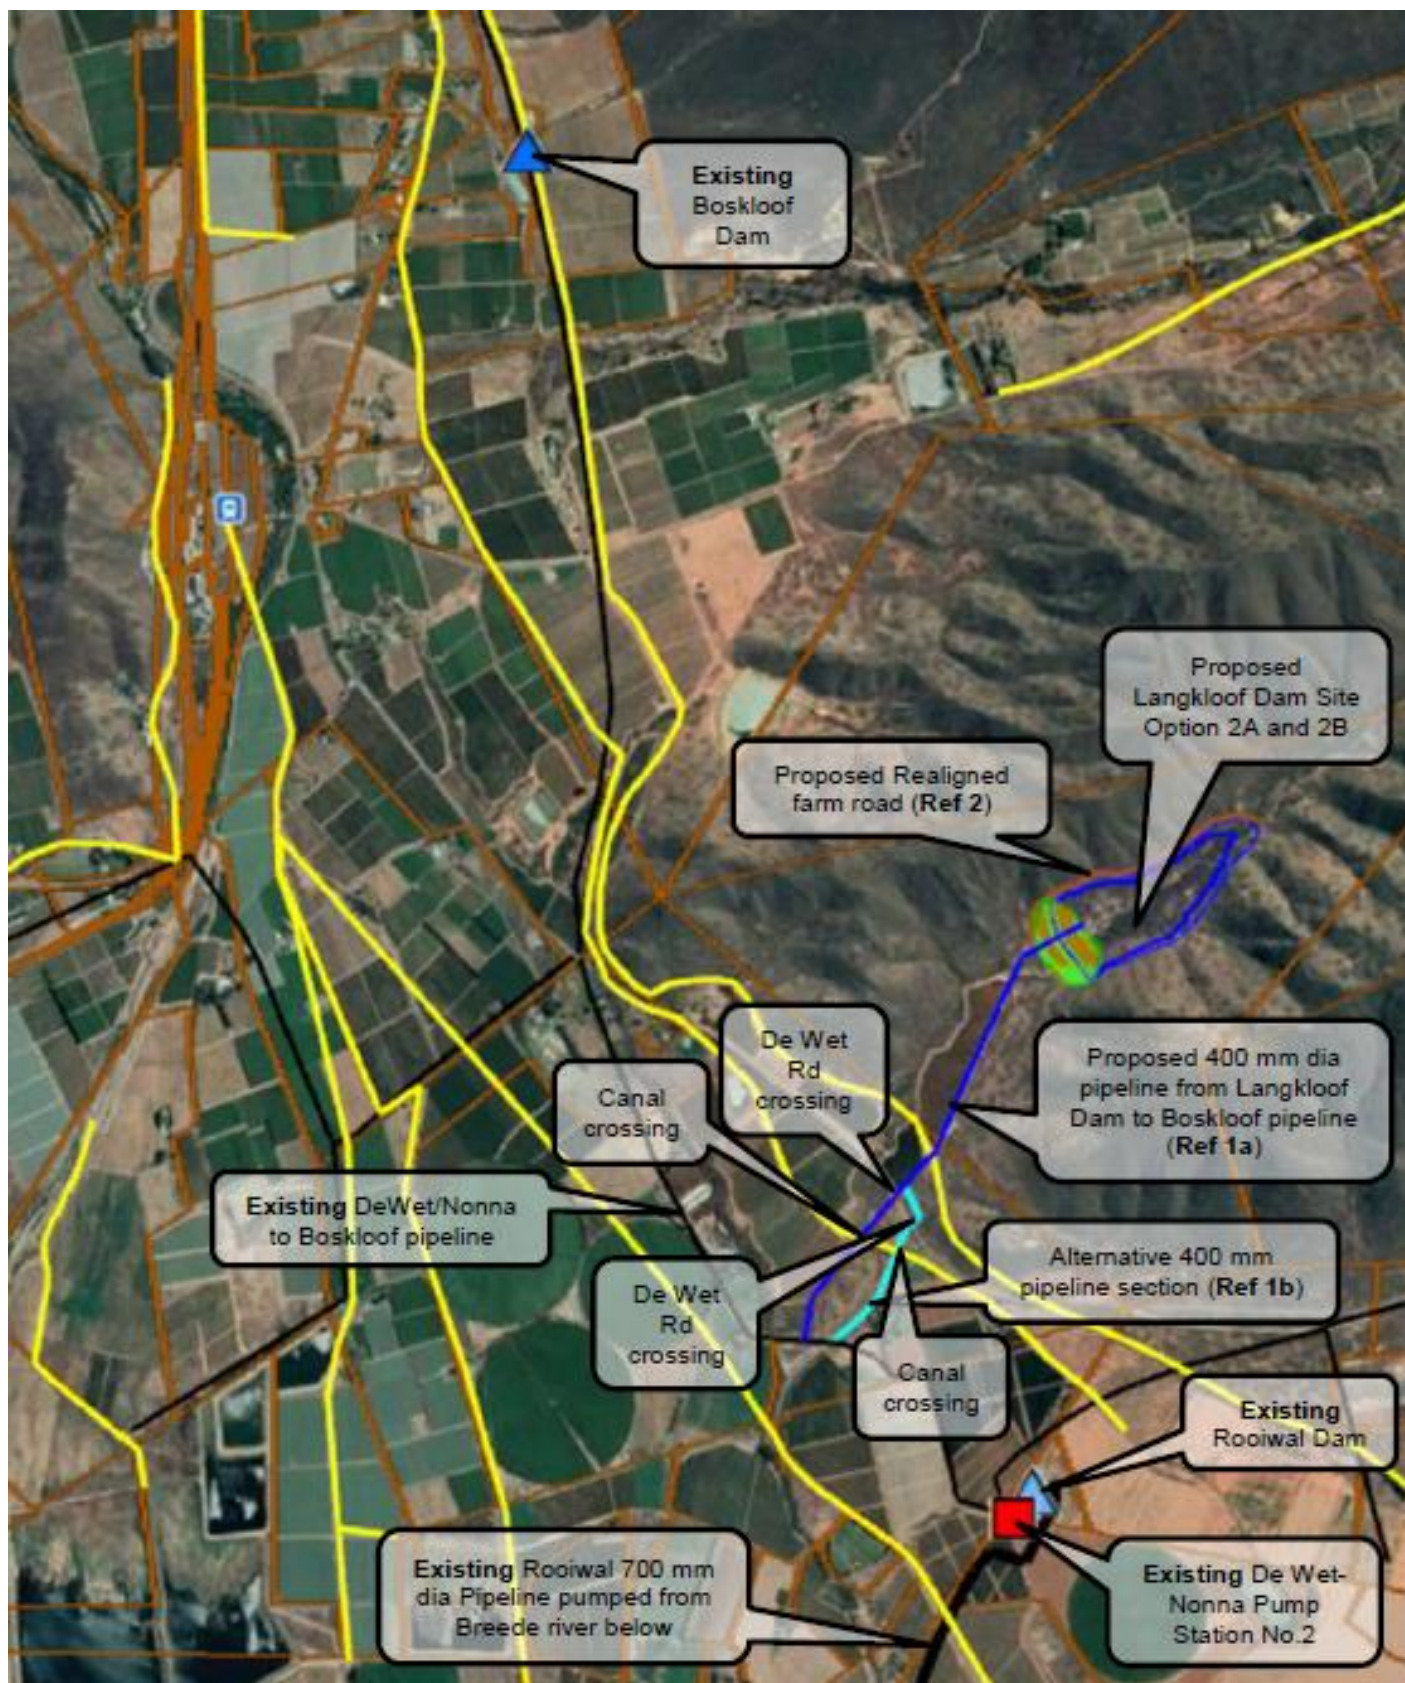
Site Plan depicting the proposed development on Portion 1 of Farm Lang Kloof No 322, Portion 22 and Remainder of Portion 4 of Farm Twee Fonteynen No. 319, Worcester.
